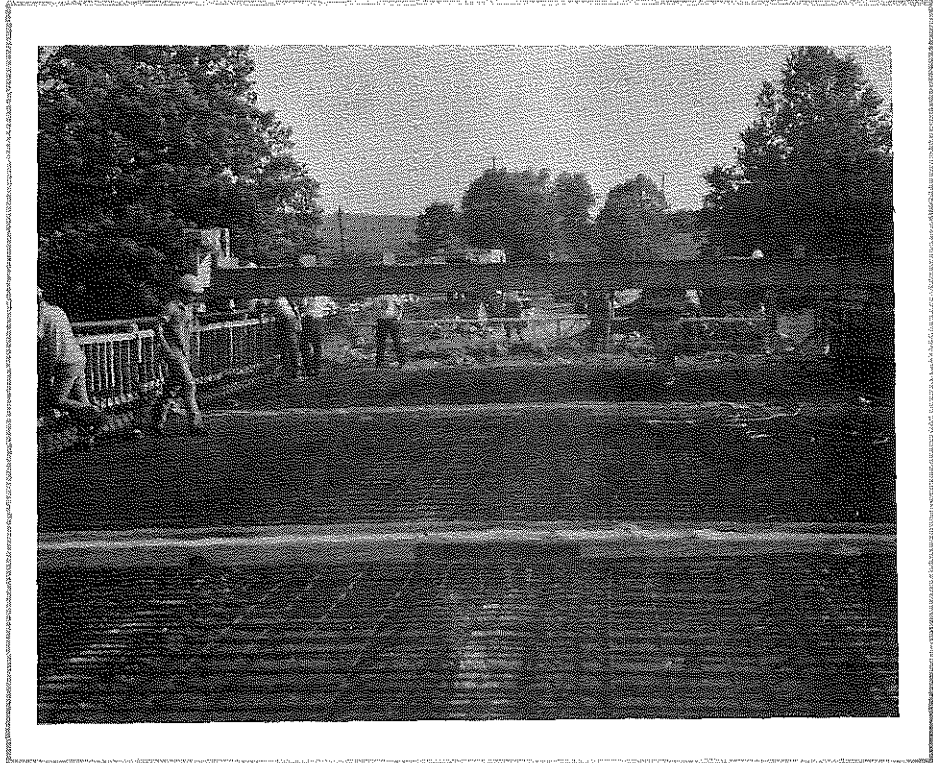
Finishing Drum and Auger of the Gomaco Finisher.
